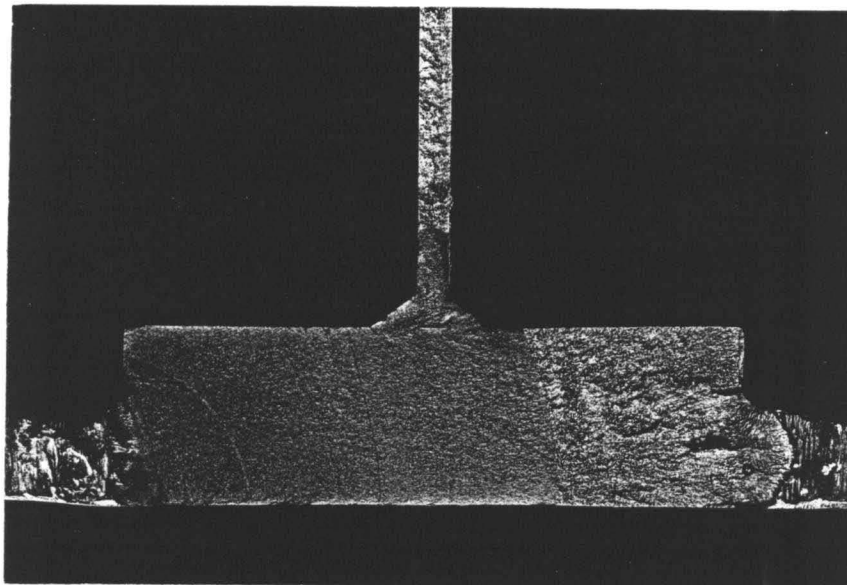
Fatigue Crack Growth from Circular Transition of Groove-Welded Gusset Plate¹²
